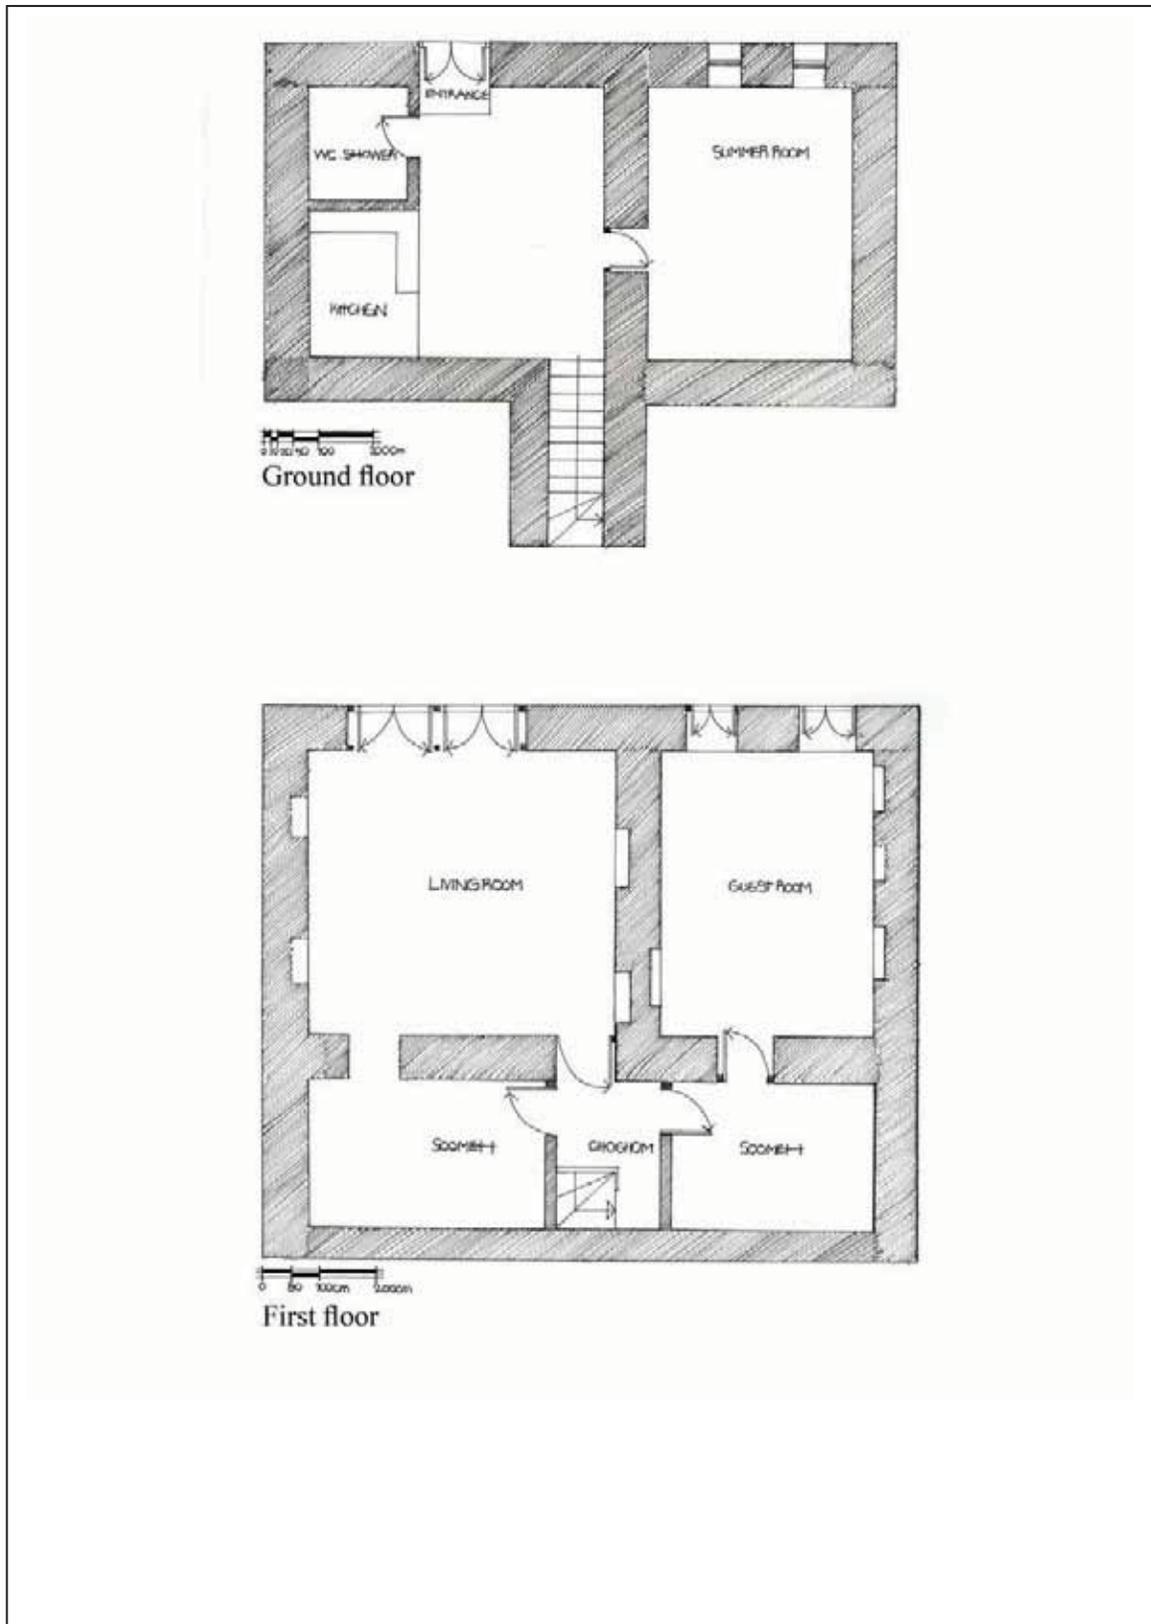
The ground and first floor plans of the Muminiyāns' house. Drawing by author, 2013.
